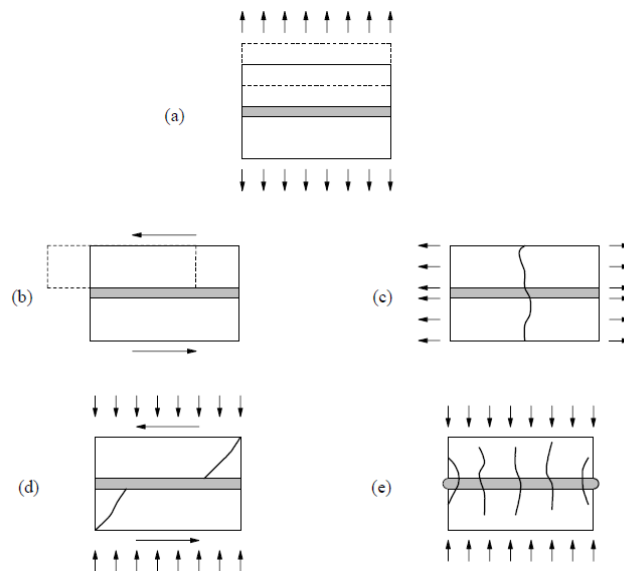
Masonry failure mechanism: joint cracking (a); joint sliding (b); unit vertical cracking (c); unit diagonal cracking (d); masonry crushing (e).
